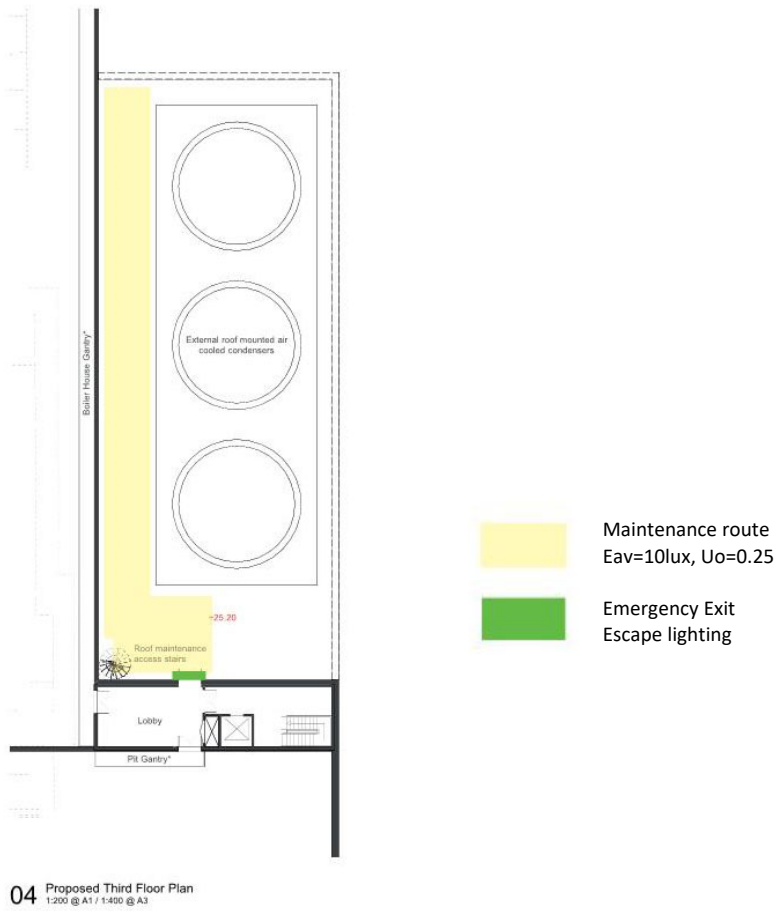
Level 3 roof, Lighting Criteria to Plant
